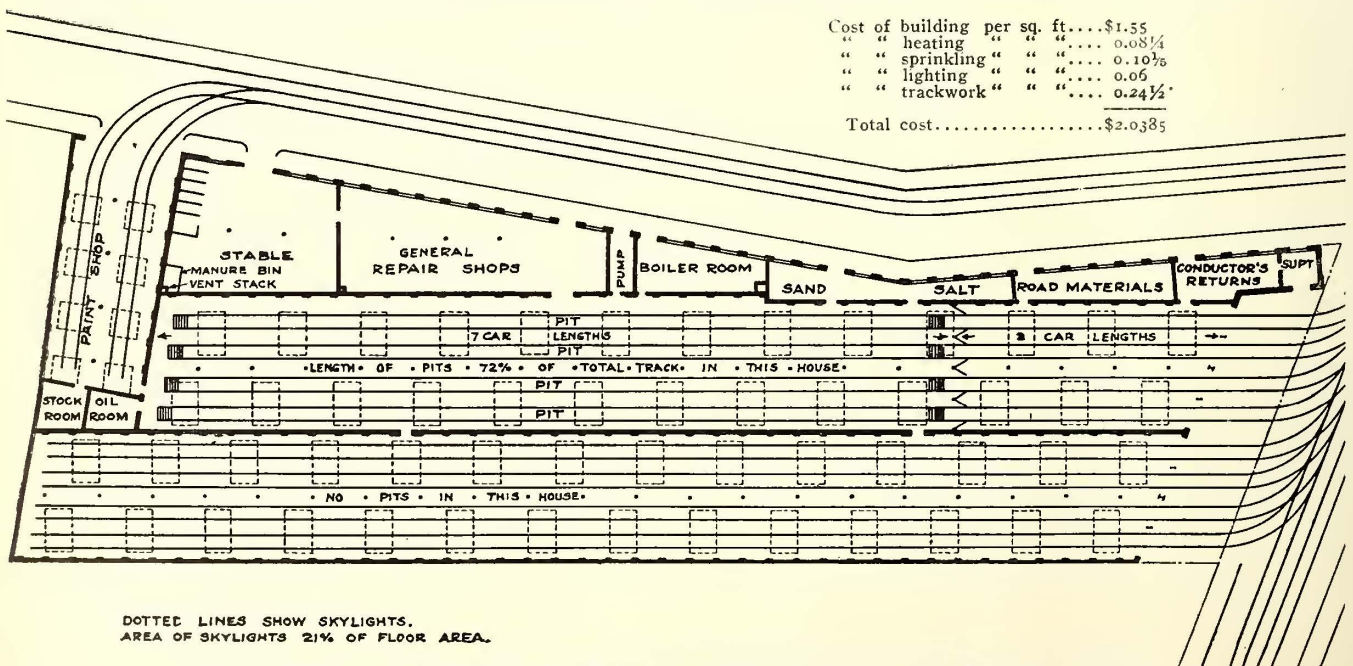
Plan of Car House, Shops, Etc., Where Painting and all Repairs are Made
